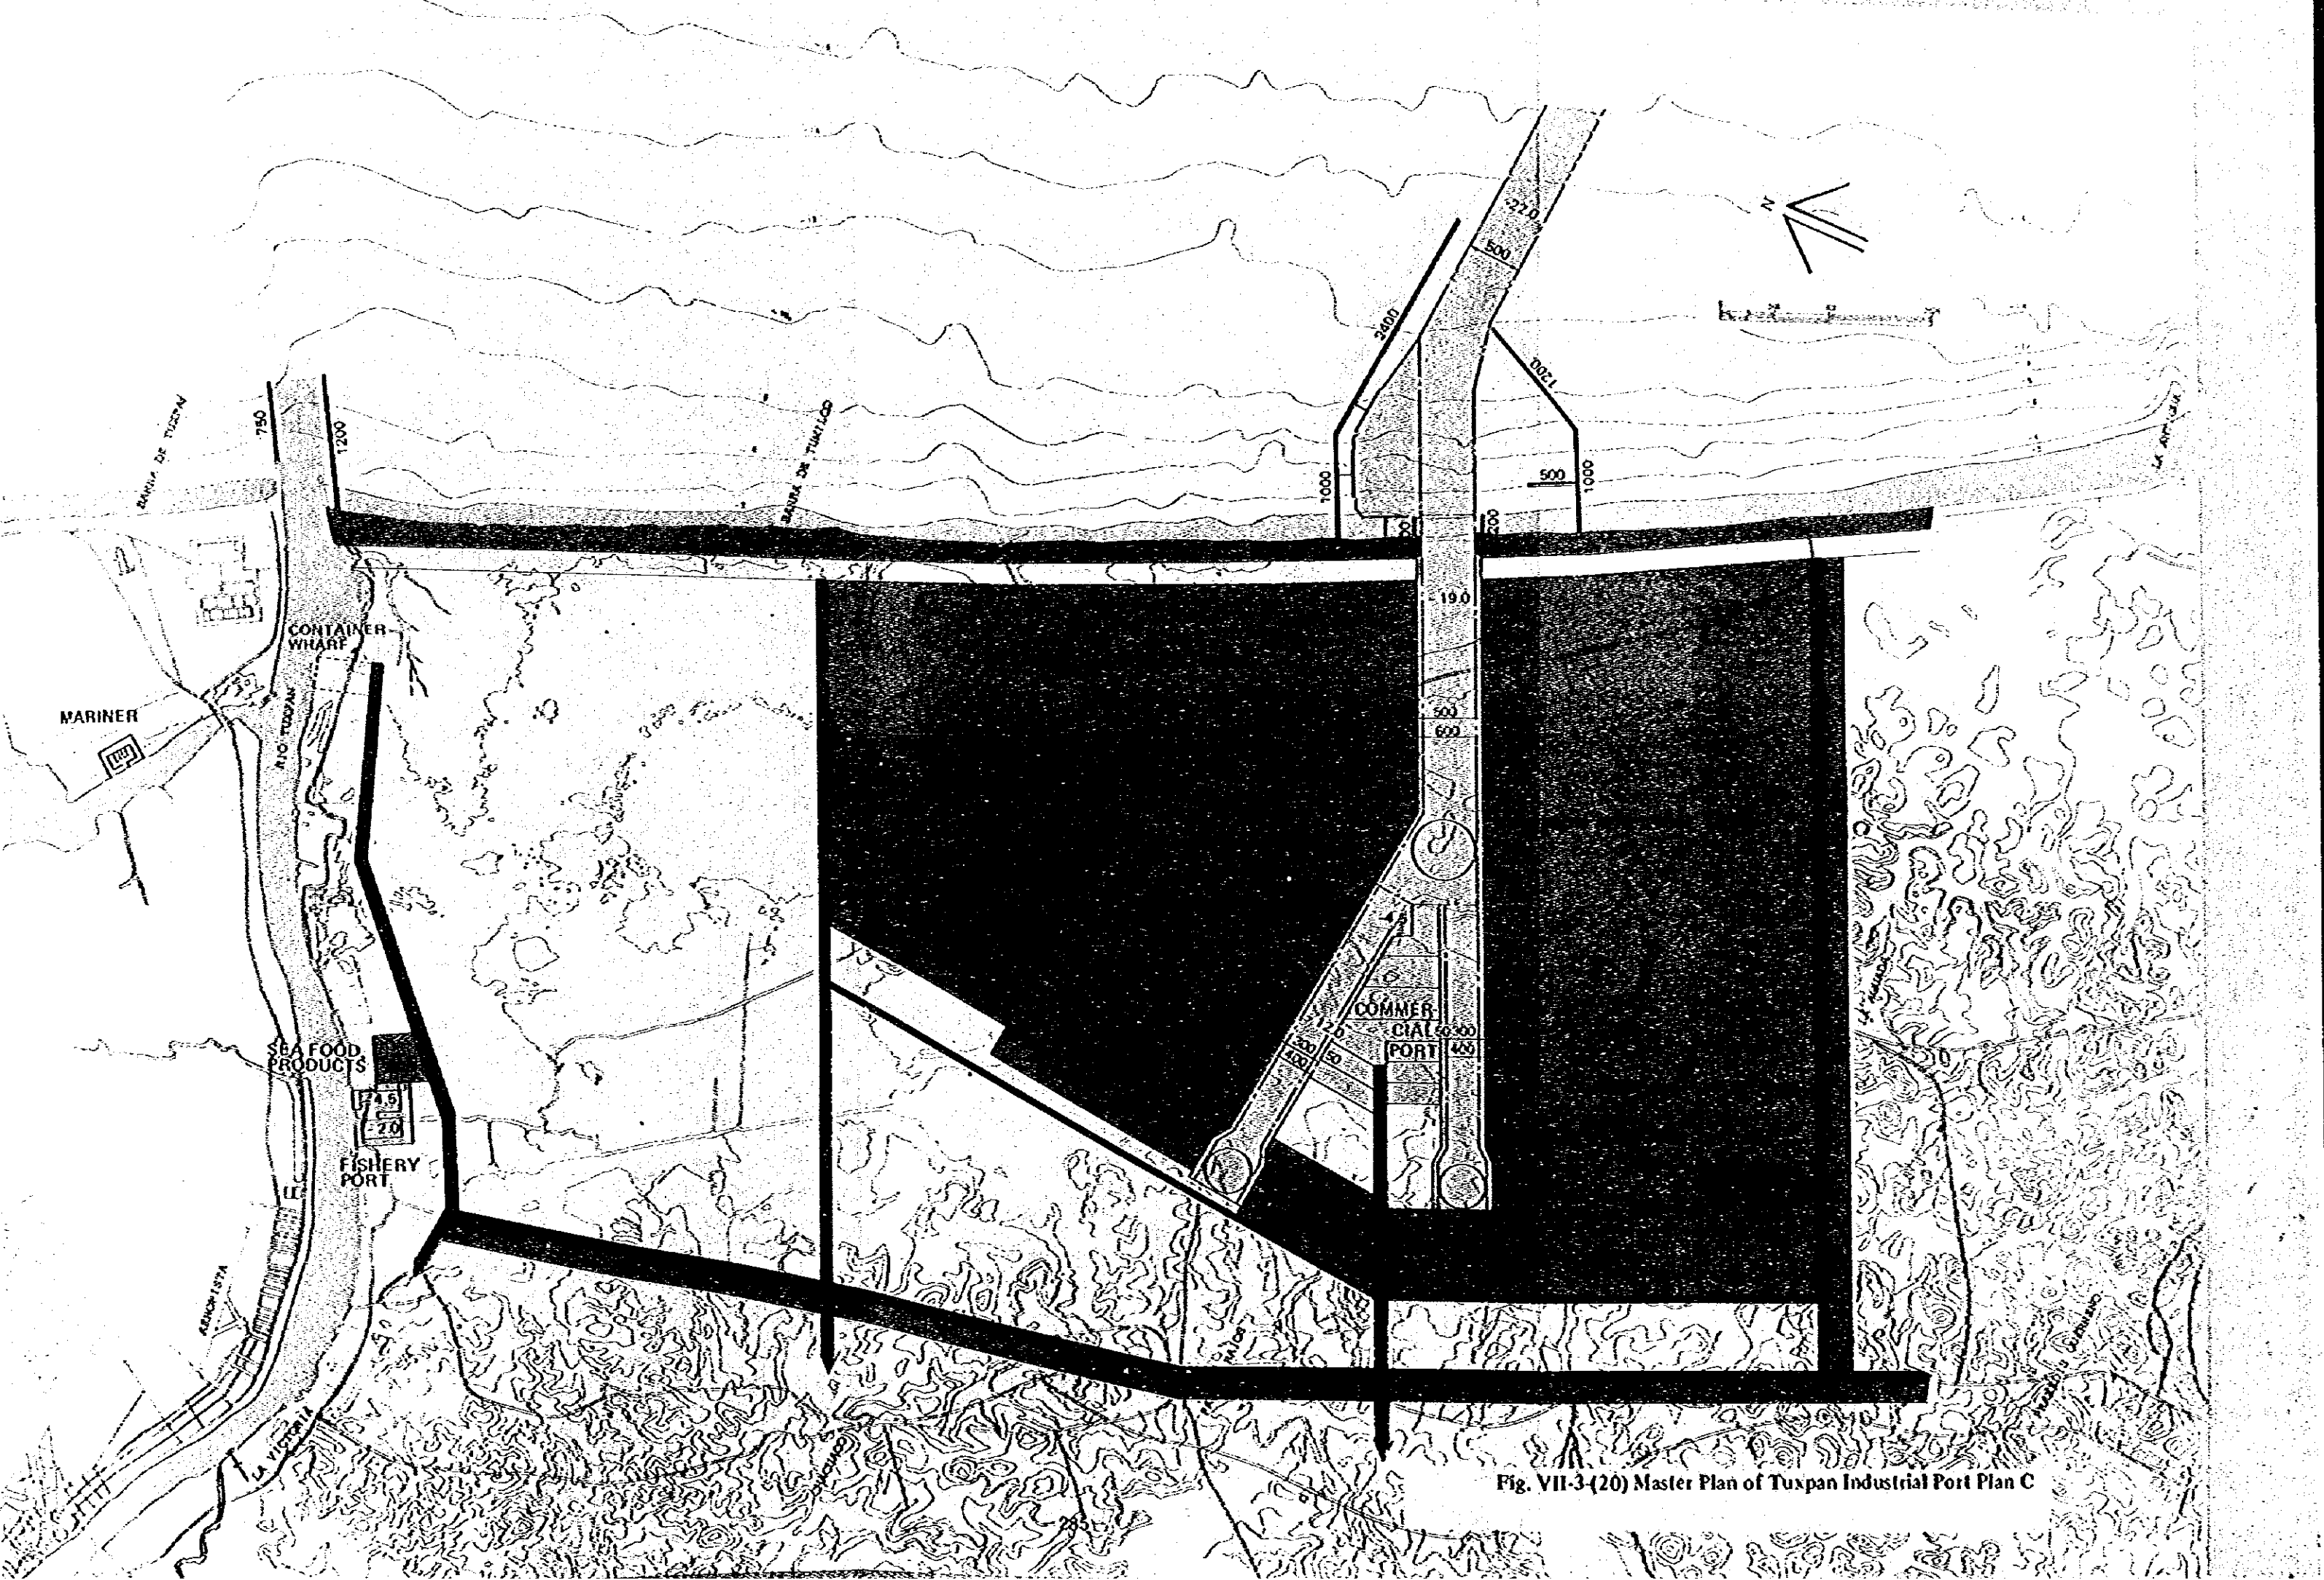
(20) Master Plan of Tuxpan Industrial Port Plan C
